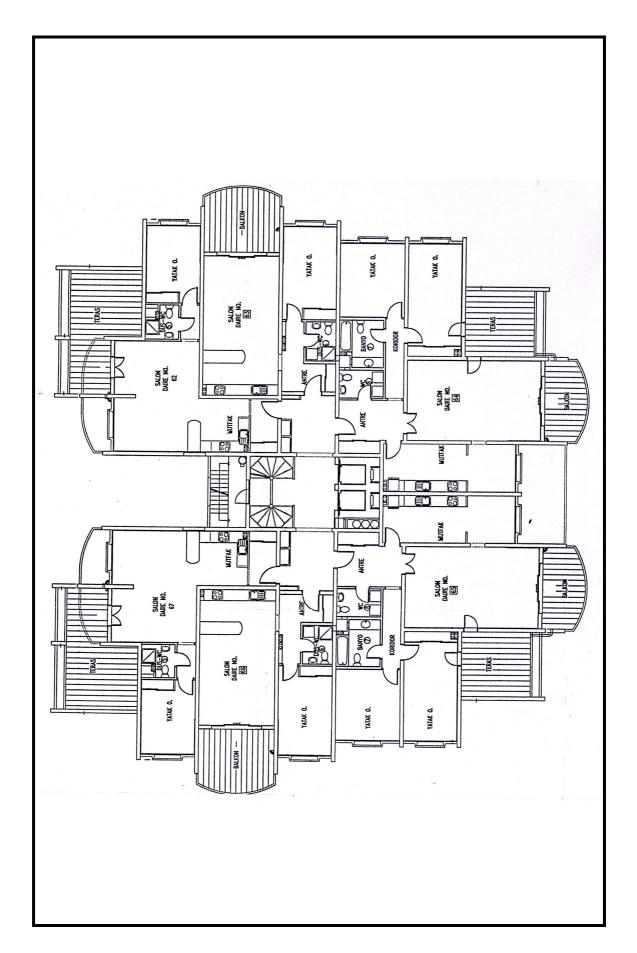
Mavişehir II; Albatros 17th – 19th Floor Plan
